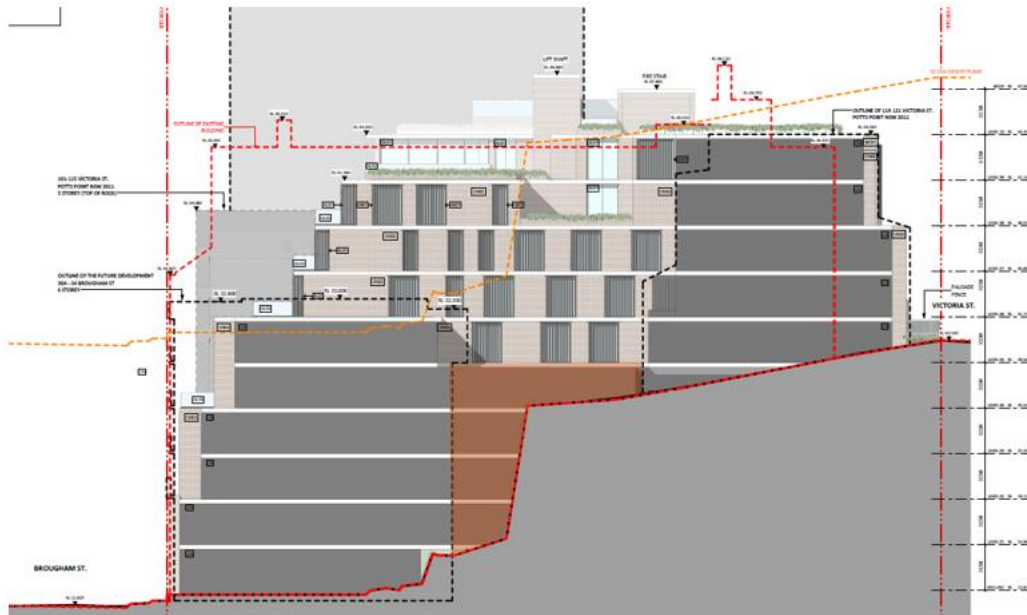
Excerpt of proposed southern elevation which shows built to boundary sections of the proposed basement levels (highlighted in orange)
